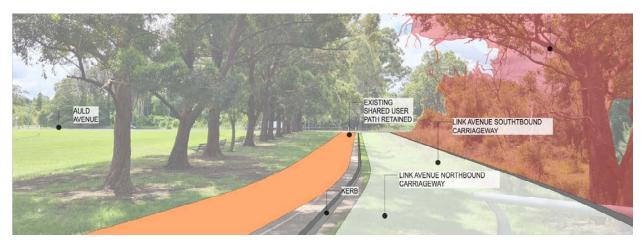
Viewpoint 6 - Proposed view Keys Parade looking north towards Auld Avenue
